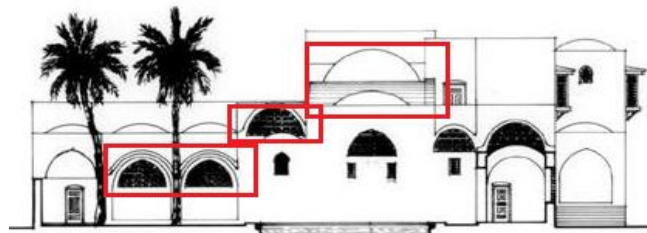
Elevation view shows the vaulted ceiling and domes of Khalil Al-Talhoony House
